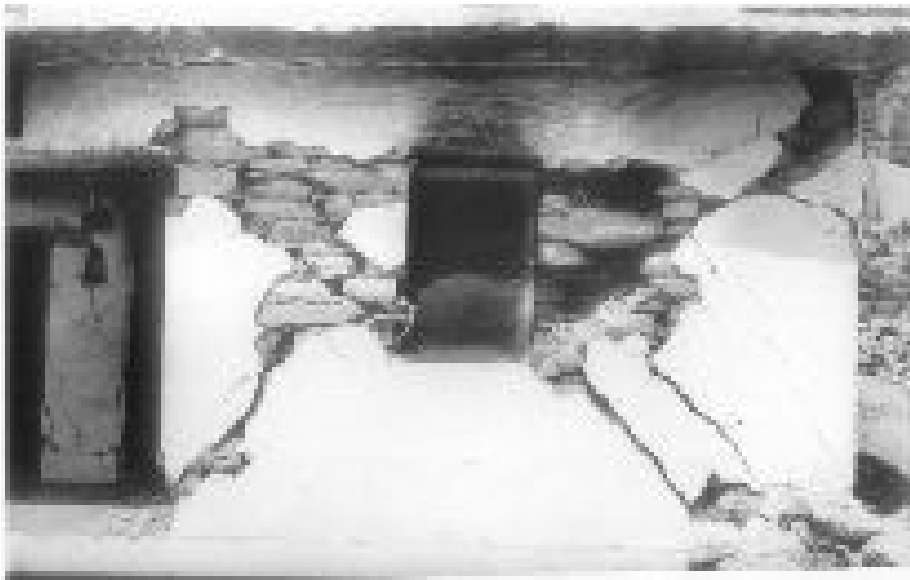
Extensive diagonal cracks in masonry walls (Ref: www.nicee.org)
